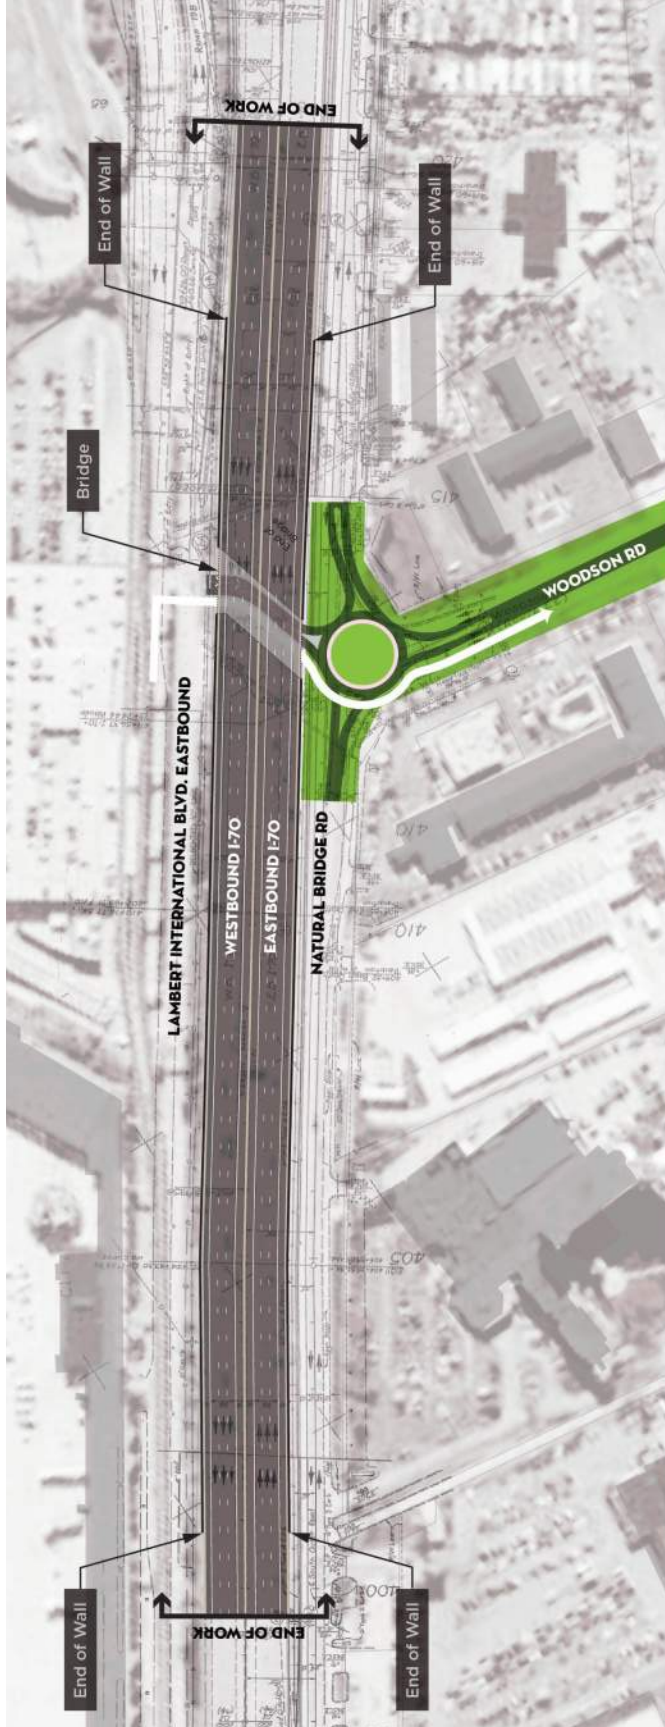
WOODSON ROAD UNDERPASS ALTERNATIVE EXTENTS PLAN & PROFILE
